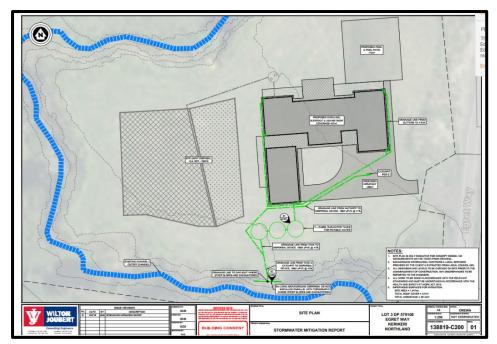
Stormwater Management Site Plan. Source: WJ Stormwater Report.
